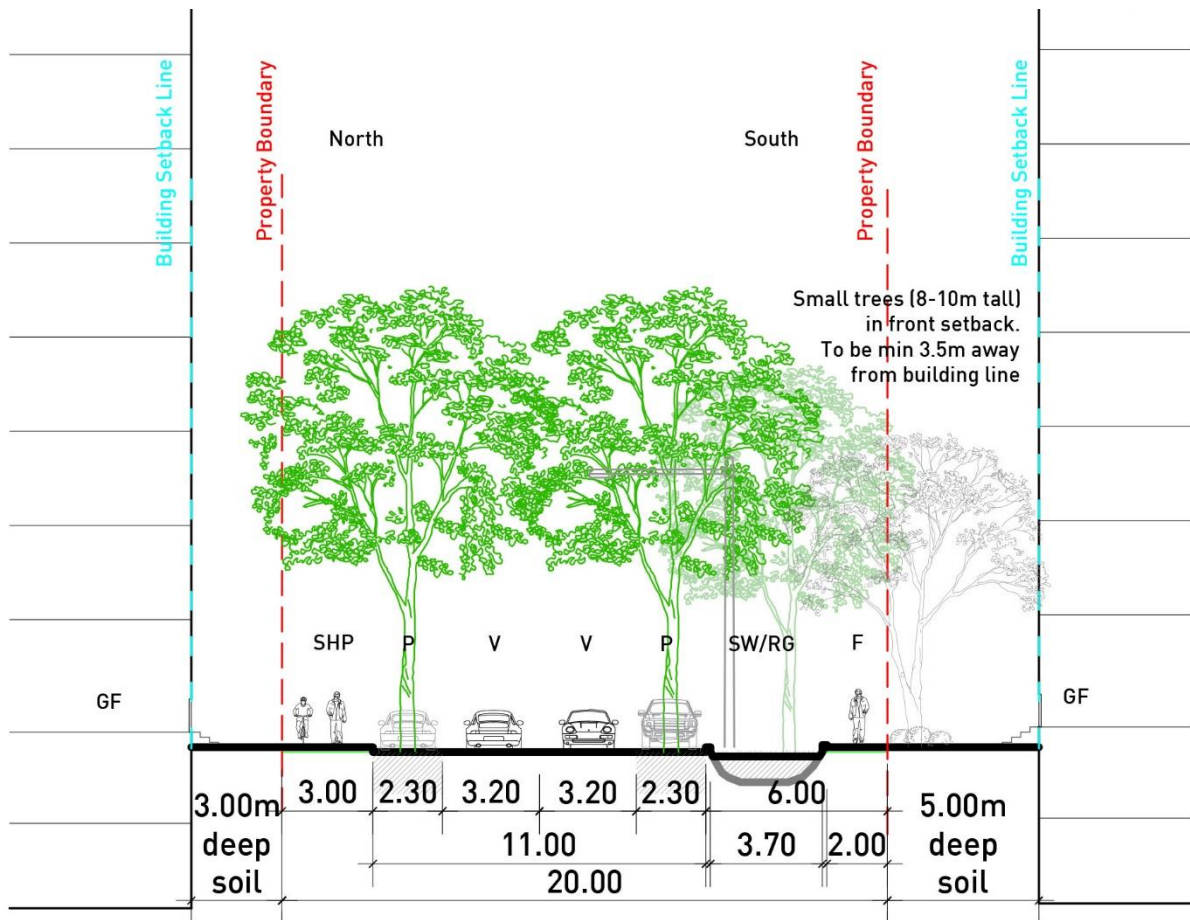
Type 3 Main East West Connector road (EWR 4)
